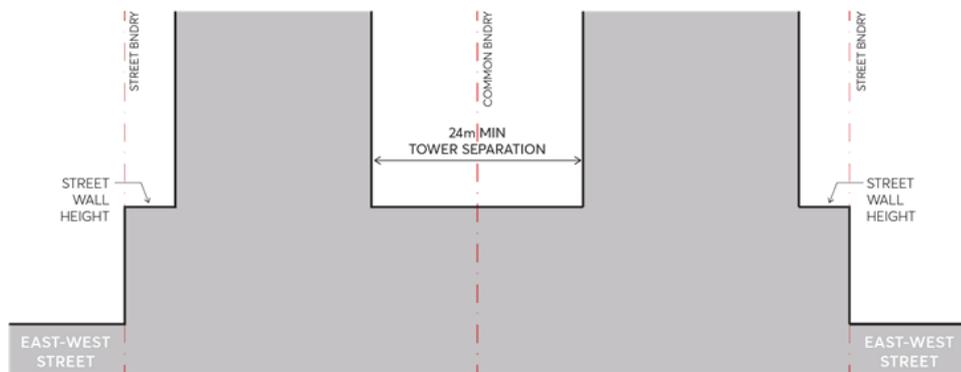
Tower separation between primarily north-south facing facades
